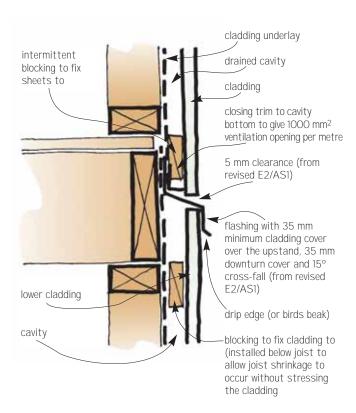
Horizontal movement-control joint monolithic-type cladding with cavity.
